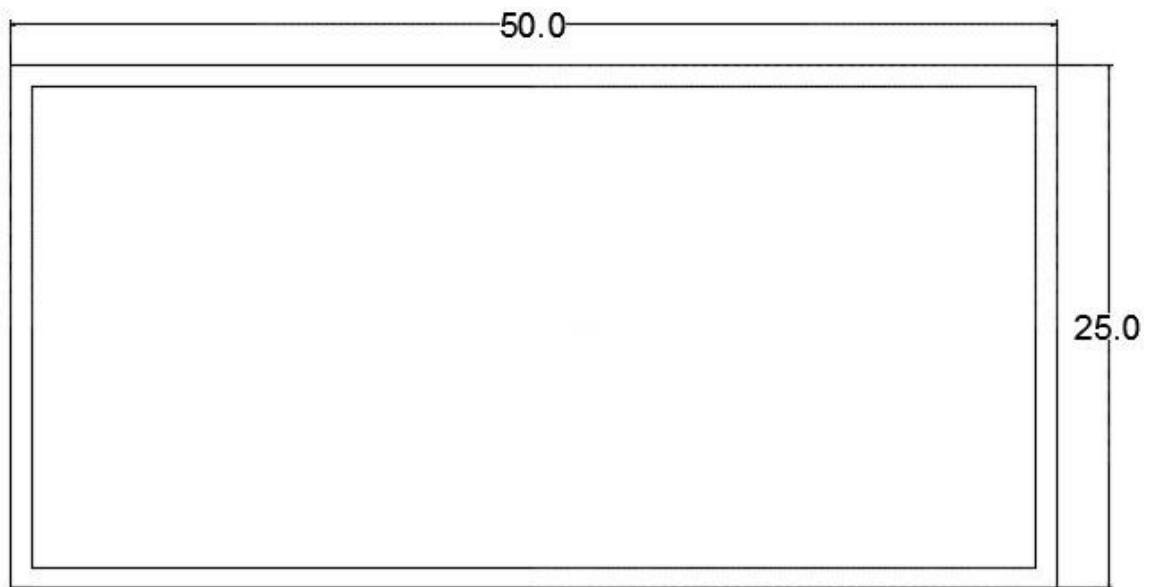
Exterior dimensions of the floor area (not-to-scale)
